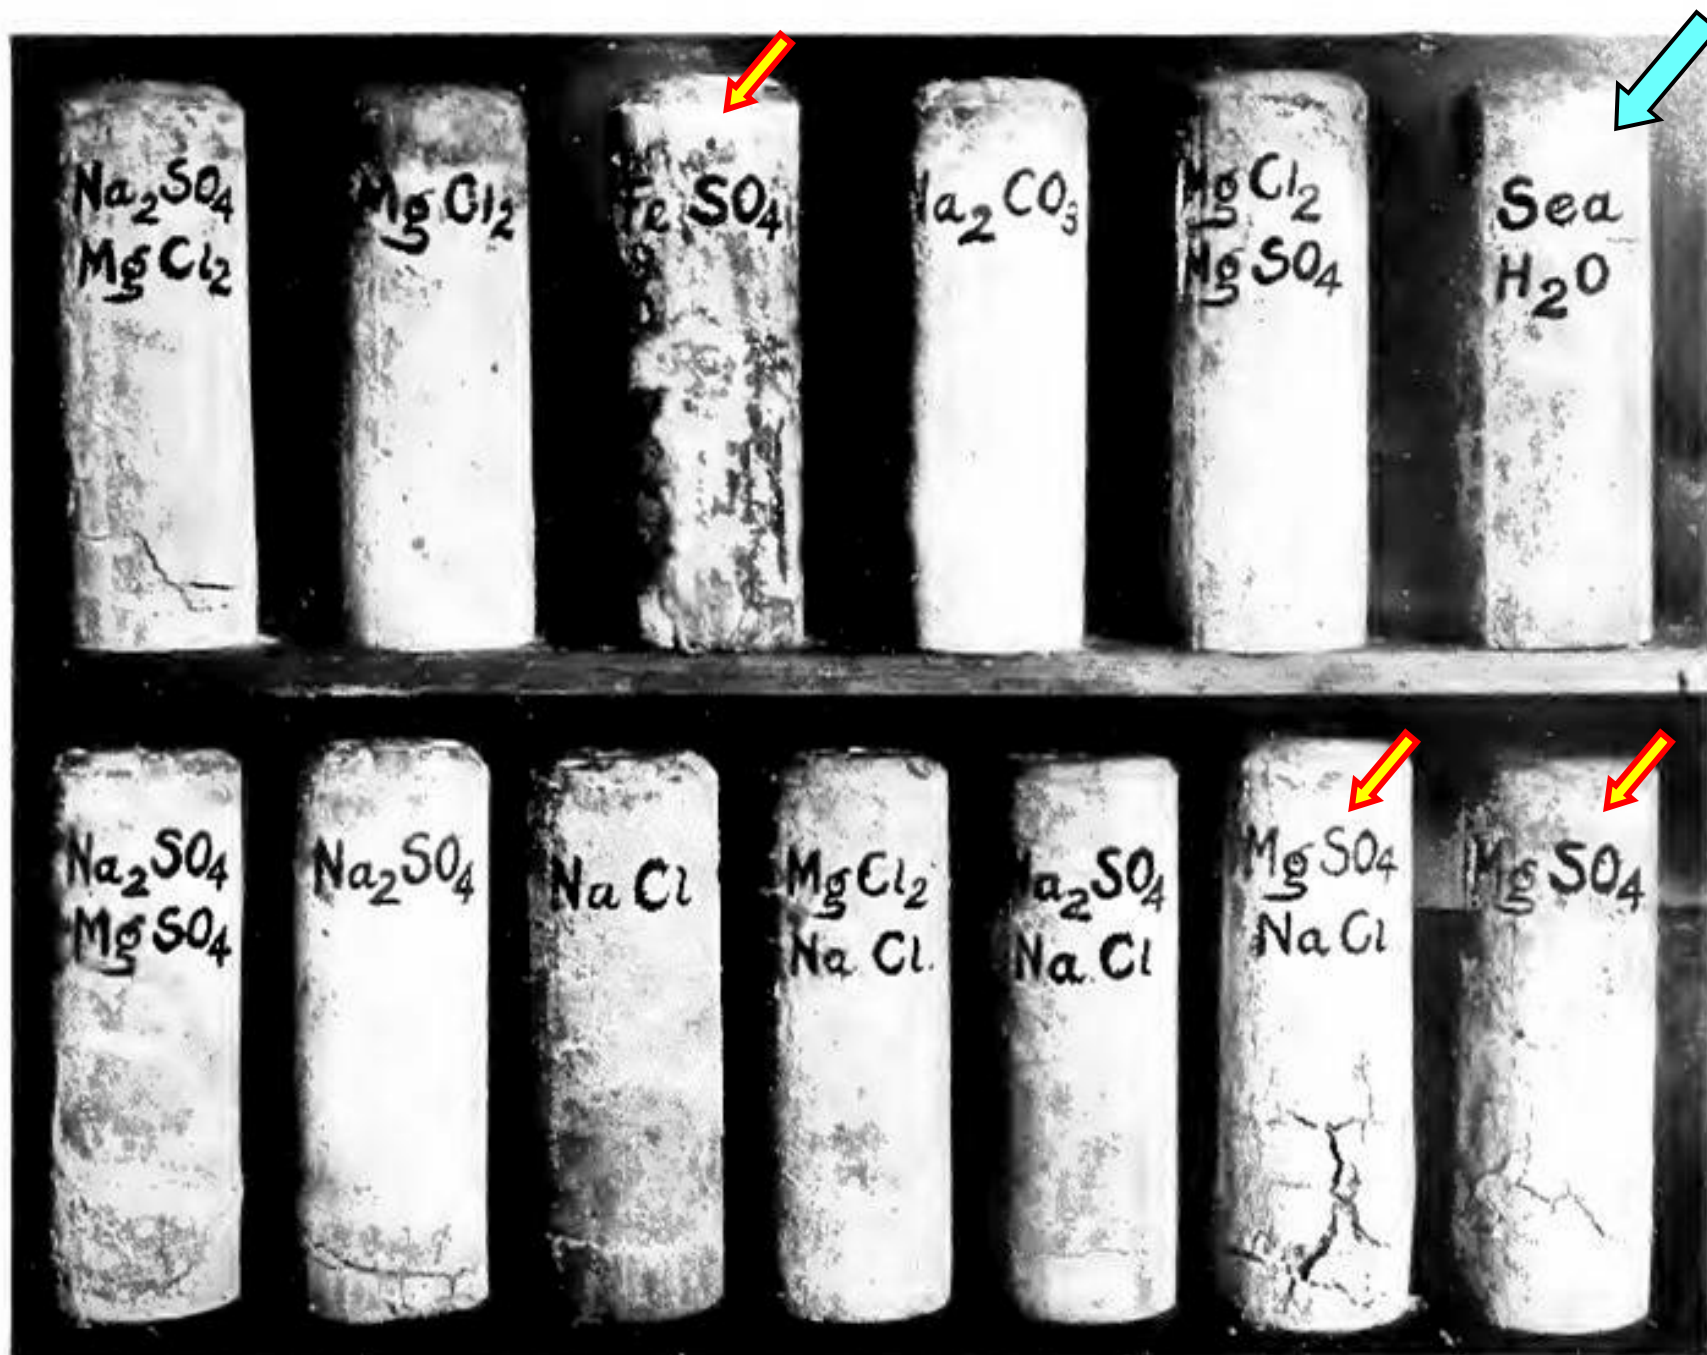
Hollow cylinders composed of one part Portland cement to two parts sand after exposure to various solutions
